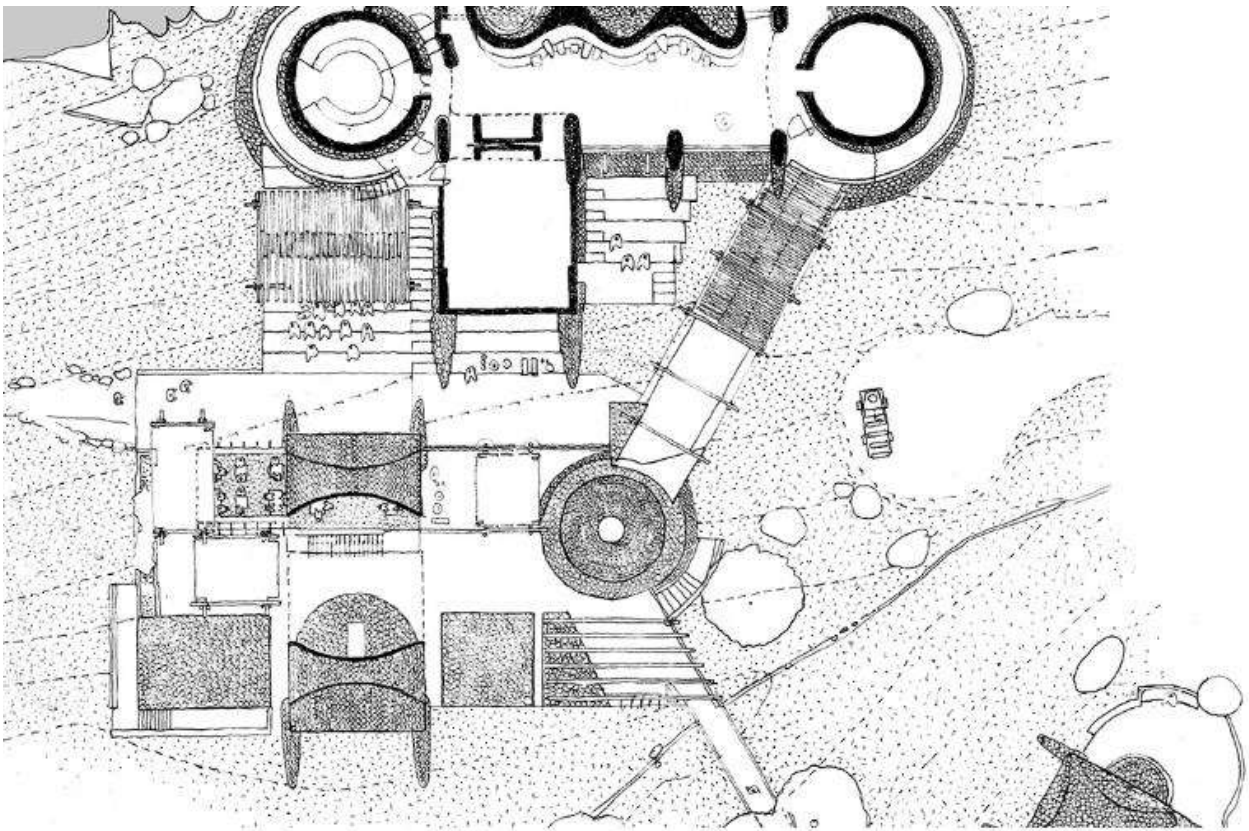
Detailed Site Plan. (Archdaily search. Accessed 23/10/2019).
